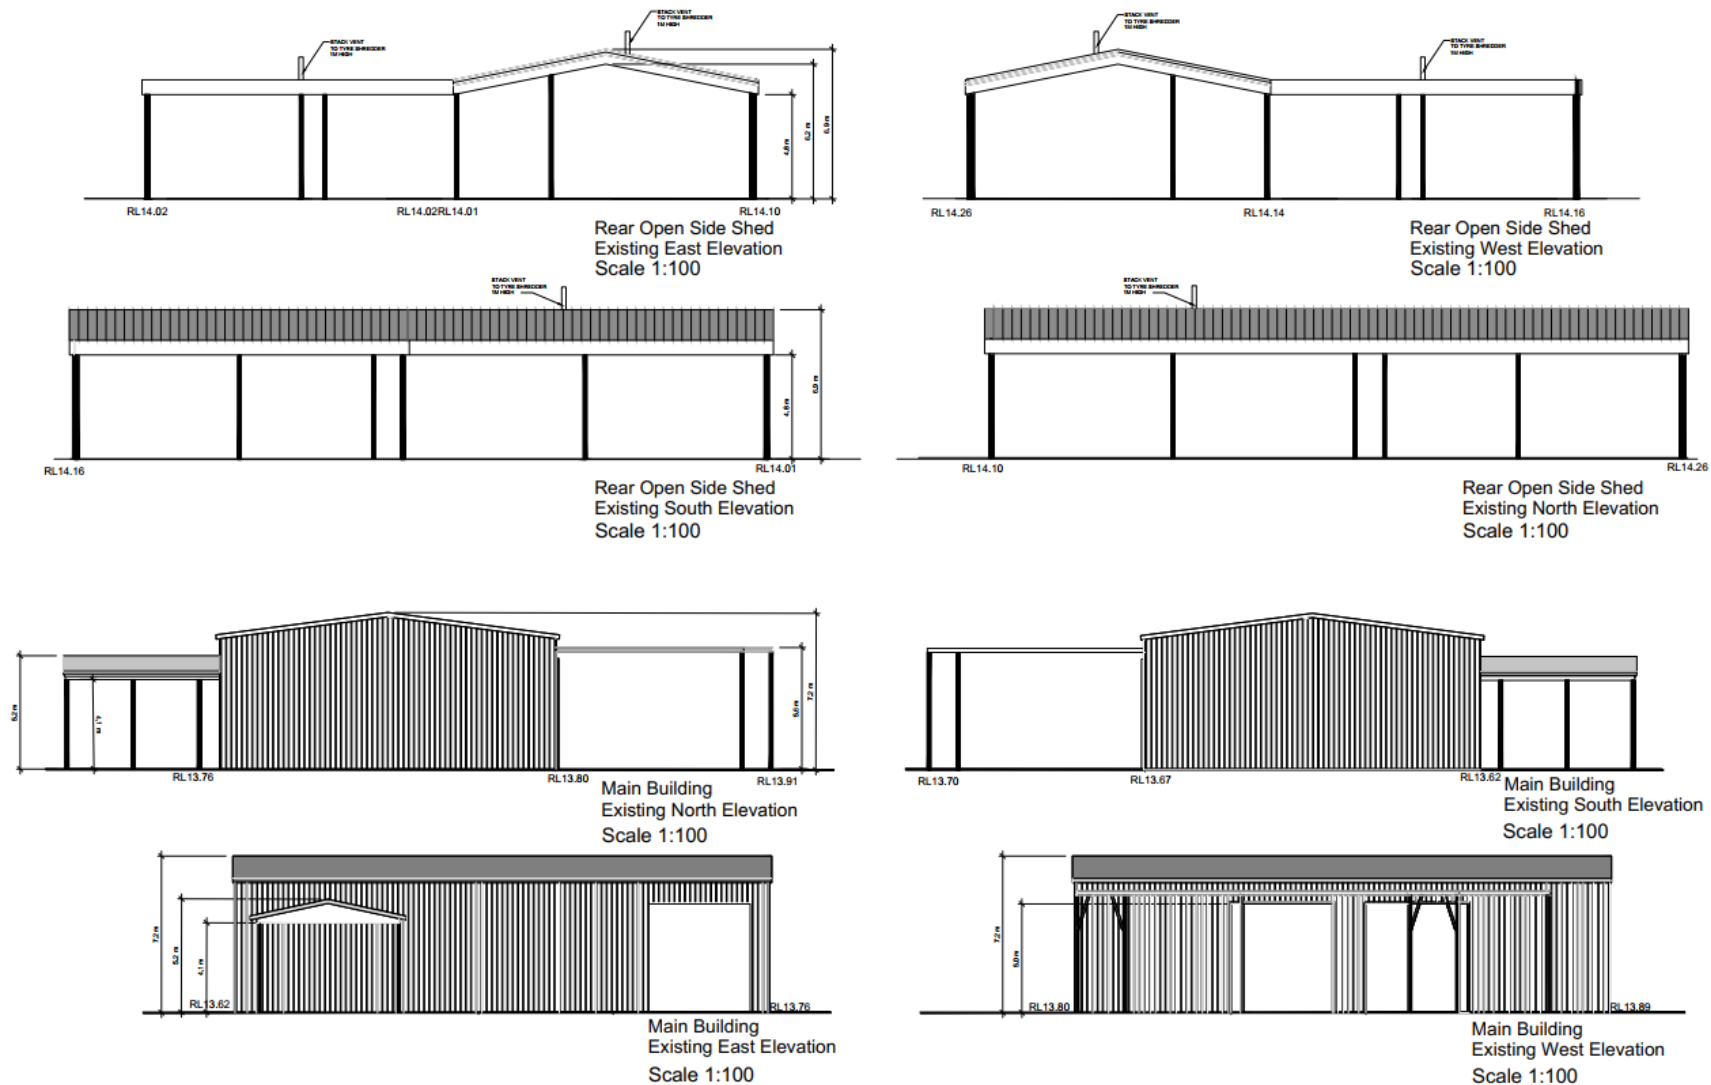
Existing Elevation Plans of 30 Daisy Street Revesby NSW (Lot 198, DP 7866). Note location of proposed local exhaust vents to rear shed.
